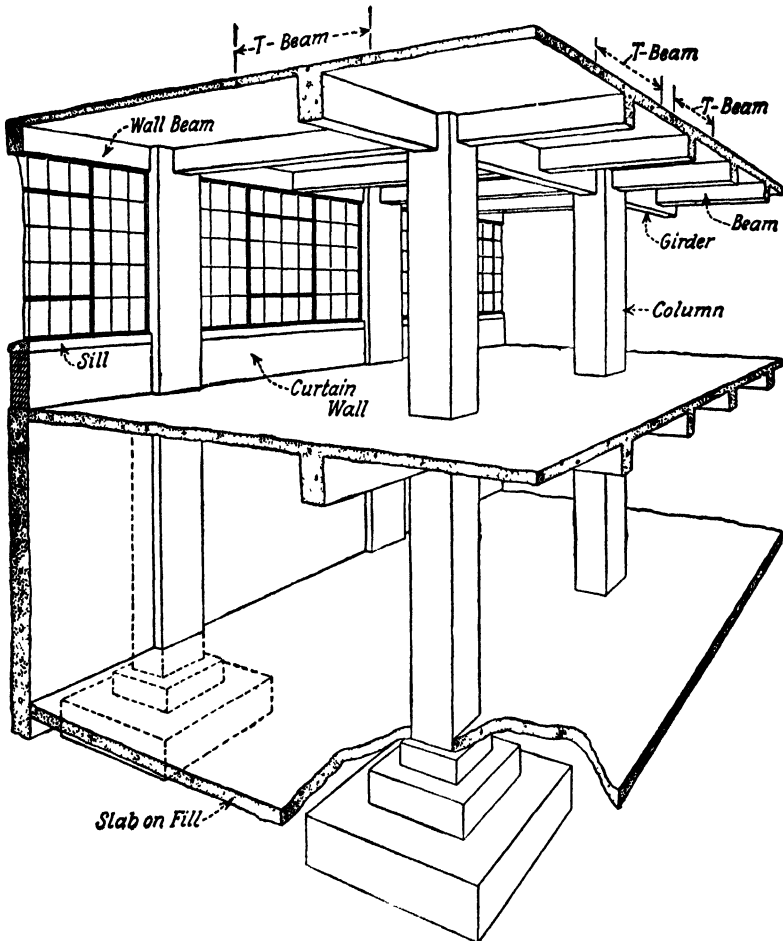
Perspective View of Beam and Girder Skeleton (reprinted by permission from "Concrete Plain and Reinforced," Taylor, Thompson and Smulski, Vol. I. Published by John Wiley & Sons, Inc.).
